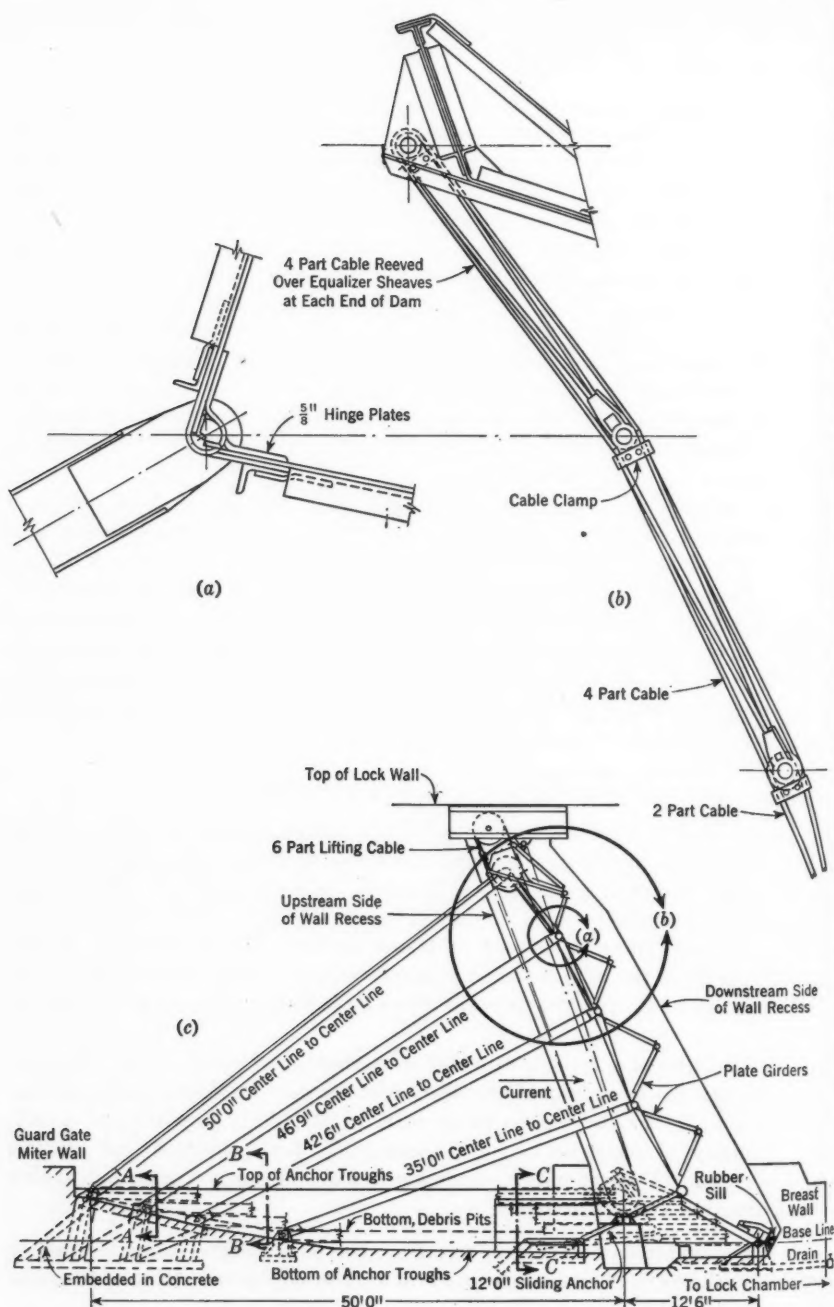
LONGITUDINAL SECTION OF DAM, SHOWING GENERAL OUTLINES AND LOCATION OF SECTIONS (FOR SECTIONS, SEE FIG. 7)
